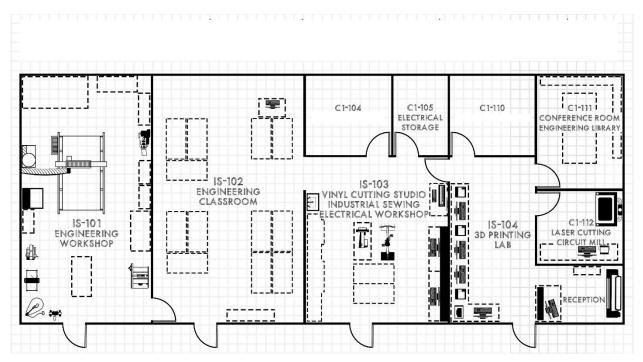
SMCC Engineering Lab + Innovation Center Floorplan
